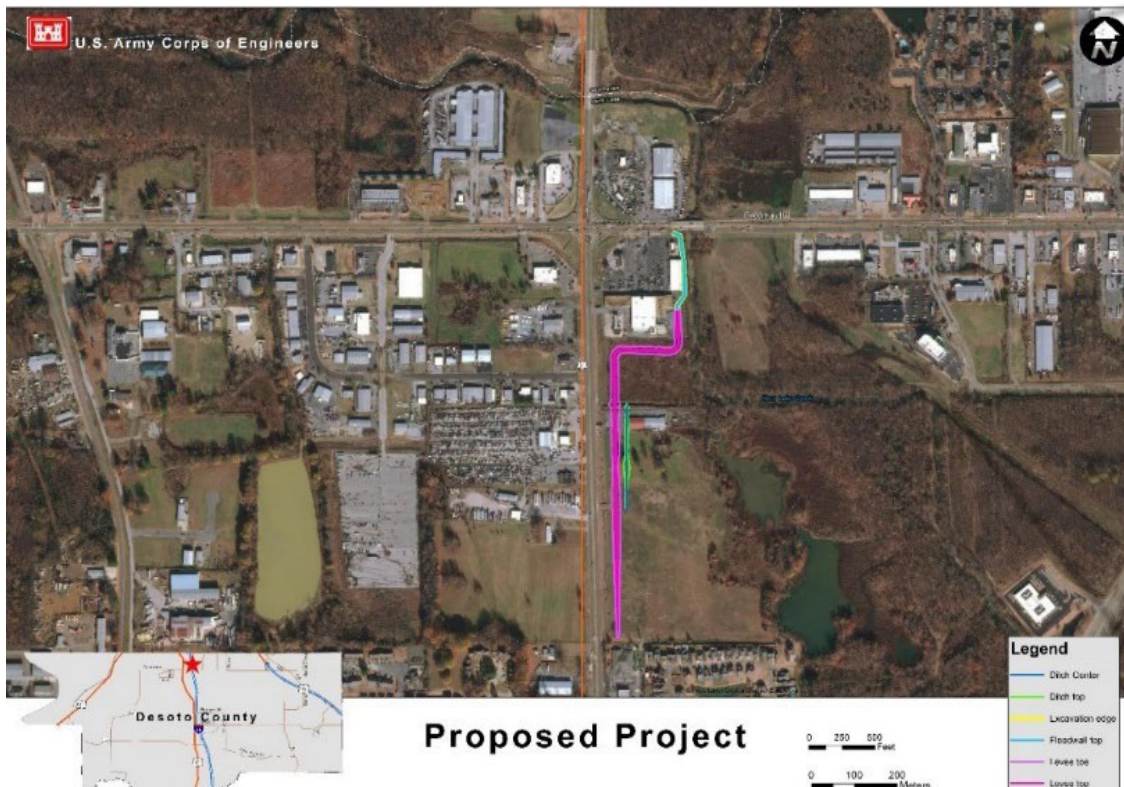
Plan 8b. (Levee and Floodwall + Dry Floodproofing of 35 structures (21 commercial and 14 residential structures))
